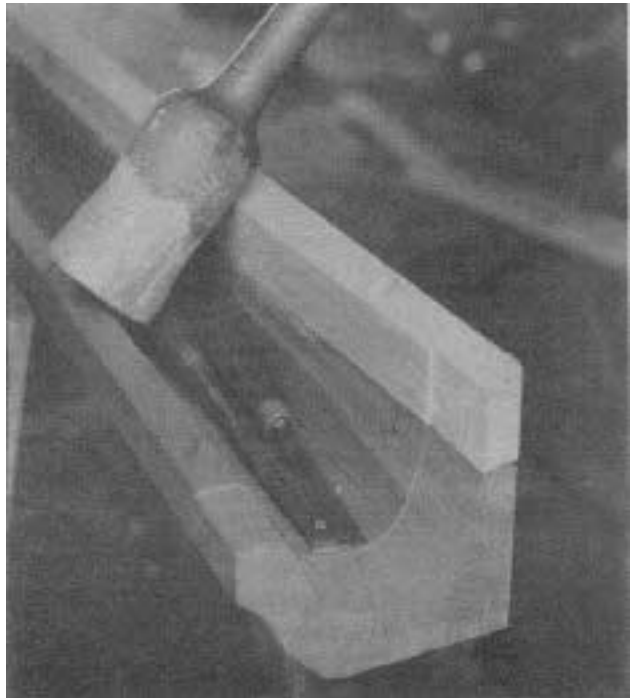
Chisel a depression out to recess the flashing where two sections of gutter meet.
